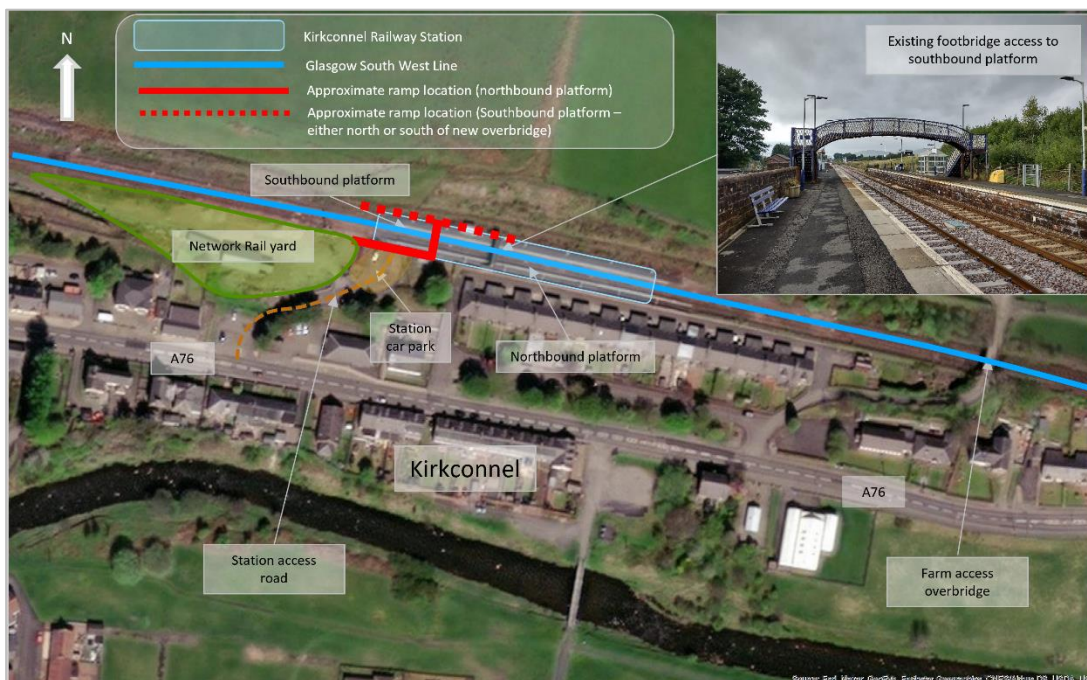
Kirkconnel Station layout with new structure with ramp access
